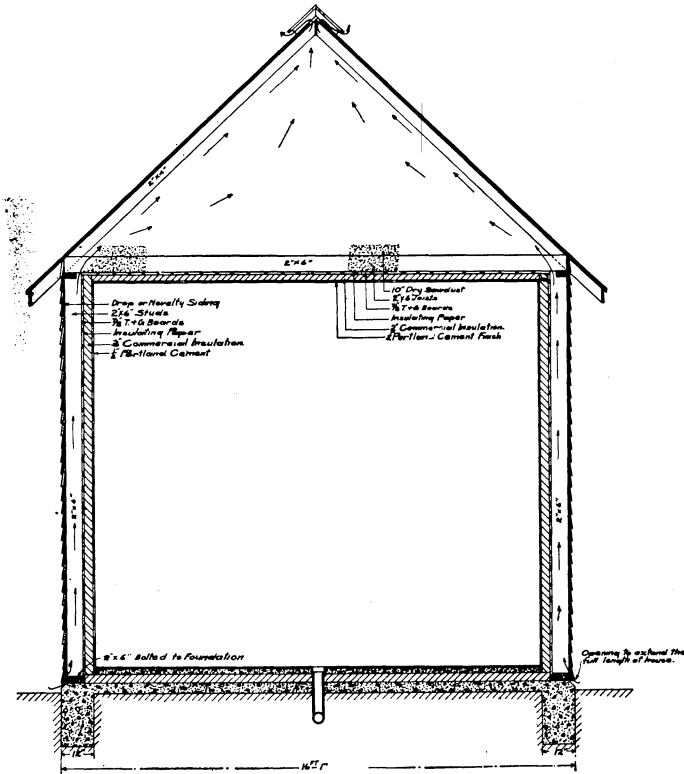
Framed ice house with commercial insulation. (Section on C-D of fig. 9.)
